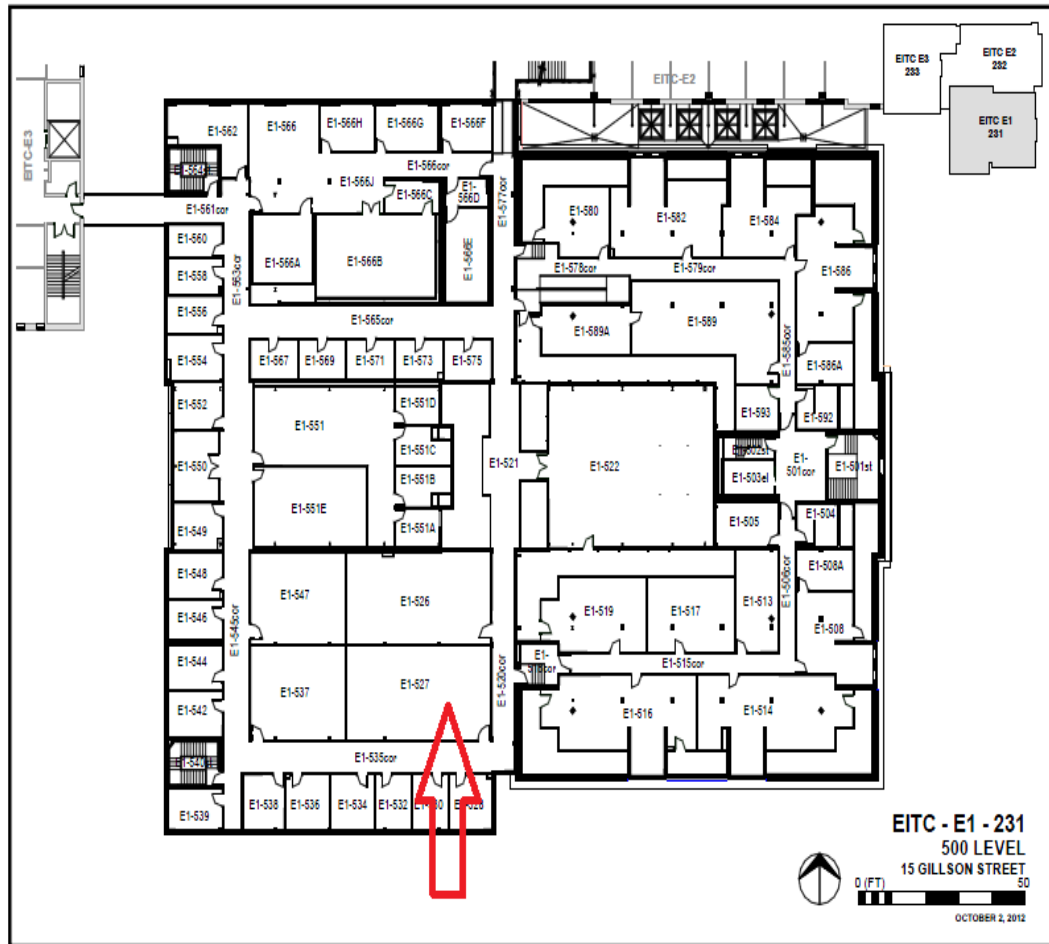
Floor map of indoor test location 2(E1-527) [55]
